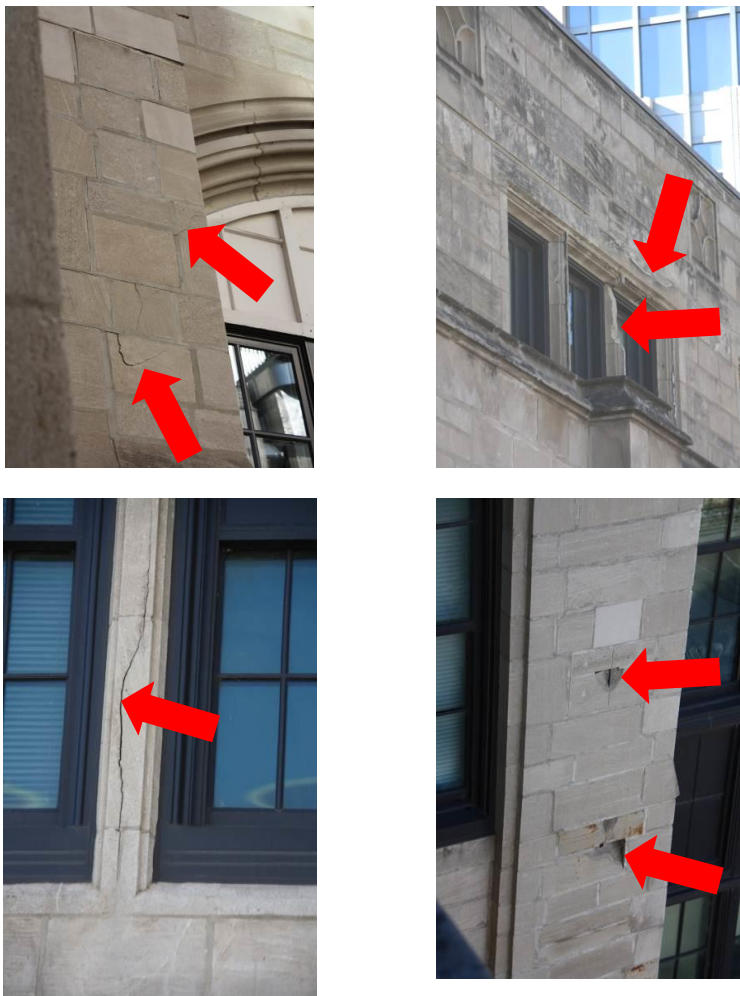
Spalled, cracked limestone due to corrosion of embedded steel strap anchors and dowels
